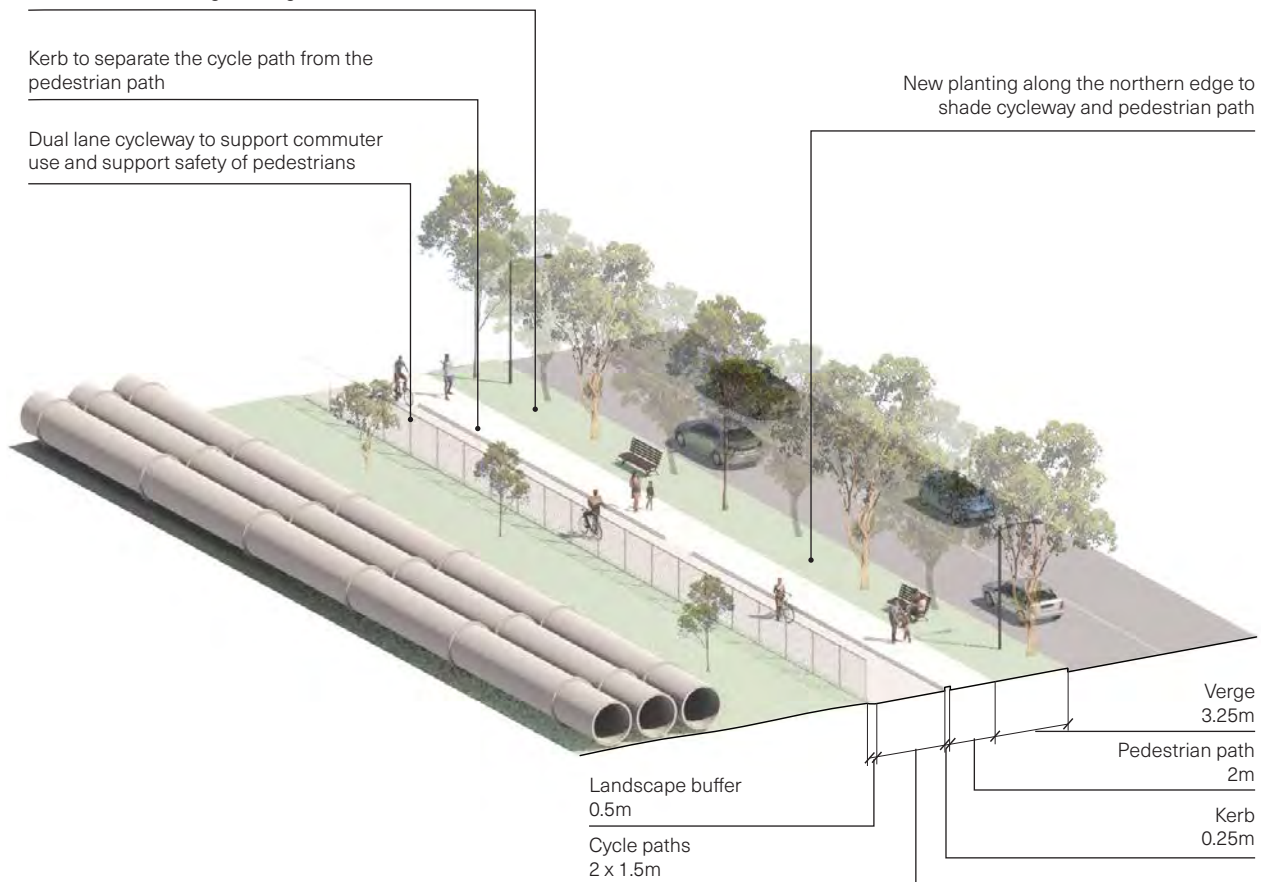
Indicative section - Proposed cyclepath adjacent to street
